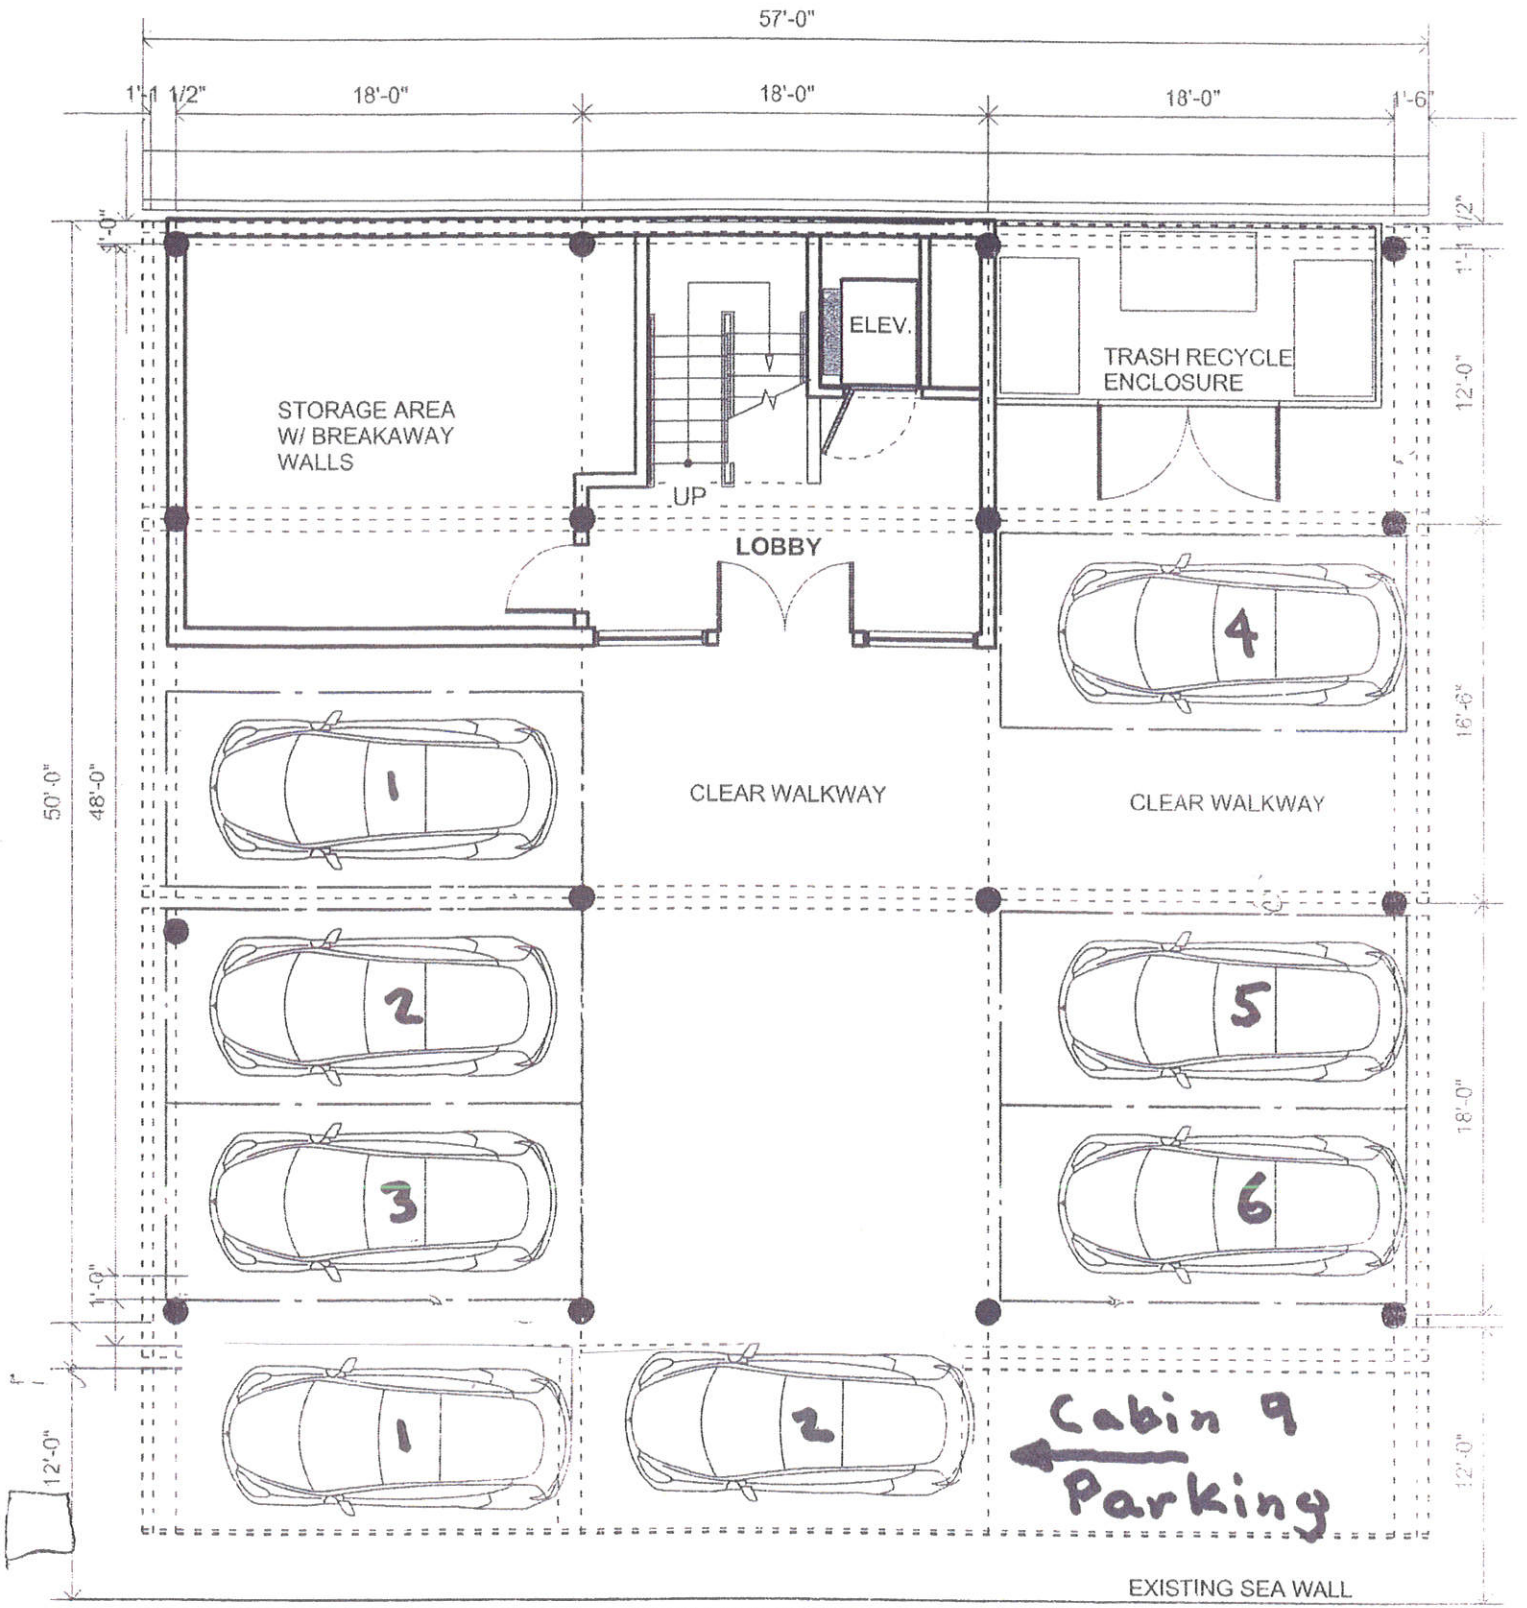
Exhibit A Parking plan for Lot 101 and 102 and driveway access to Lot 100
